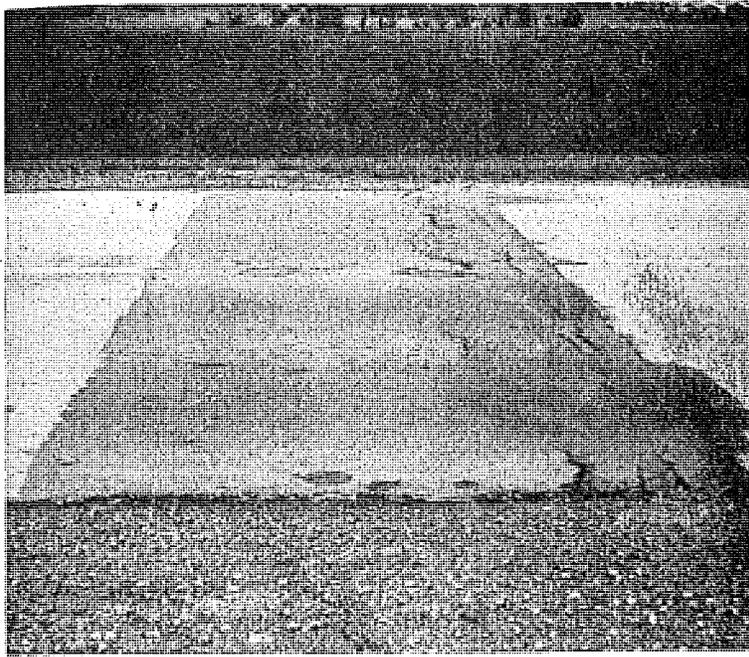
Resurfacing. In an area at least a full lane in width, (a) the covering-over with or without the removal of the existing pavement, or (b) removal and replacement of all existing pavement with portland cement concrete, bituminous concrete, tar and chip mix, or other materials.
